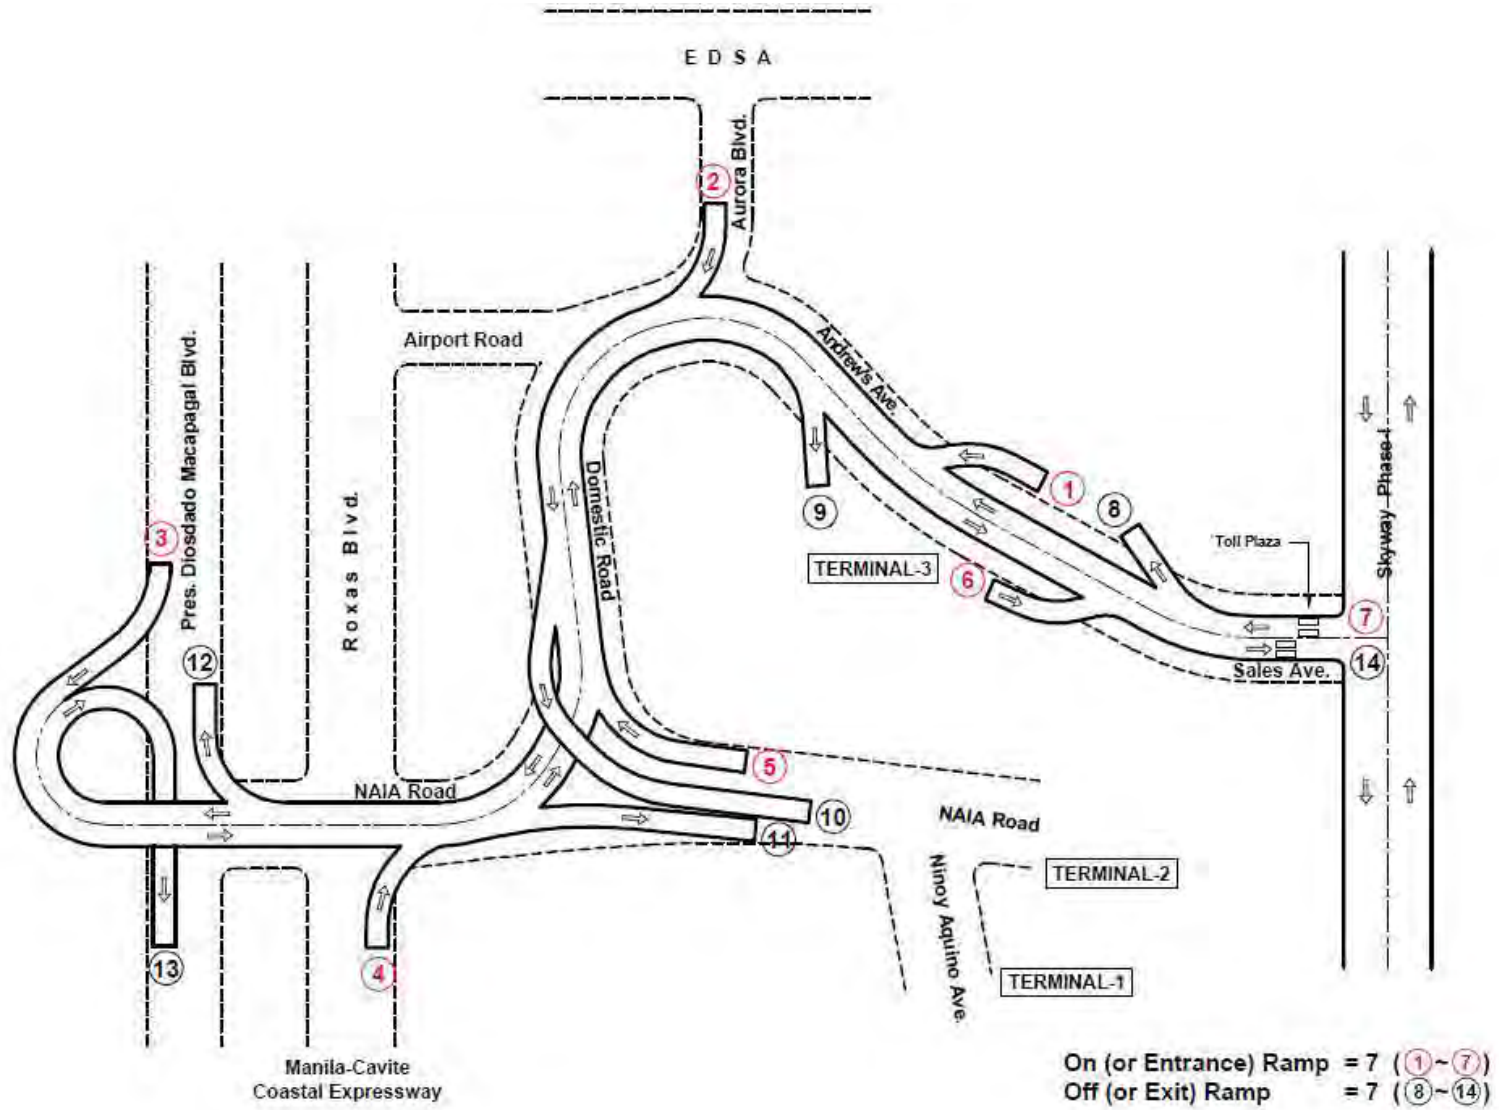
SCHEMATIC RAMP LAYOUT
